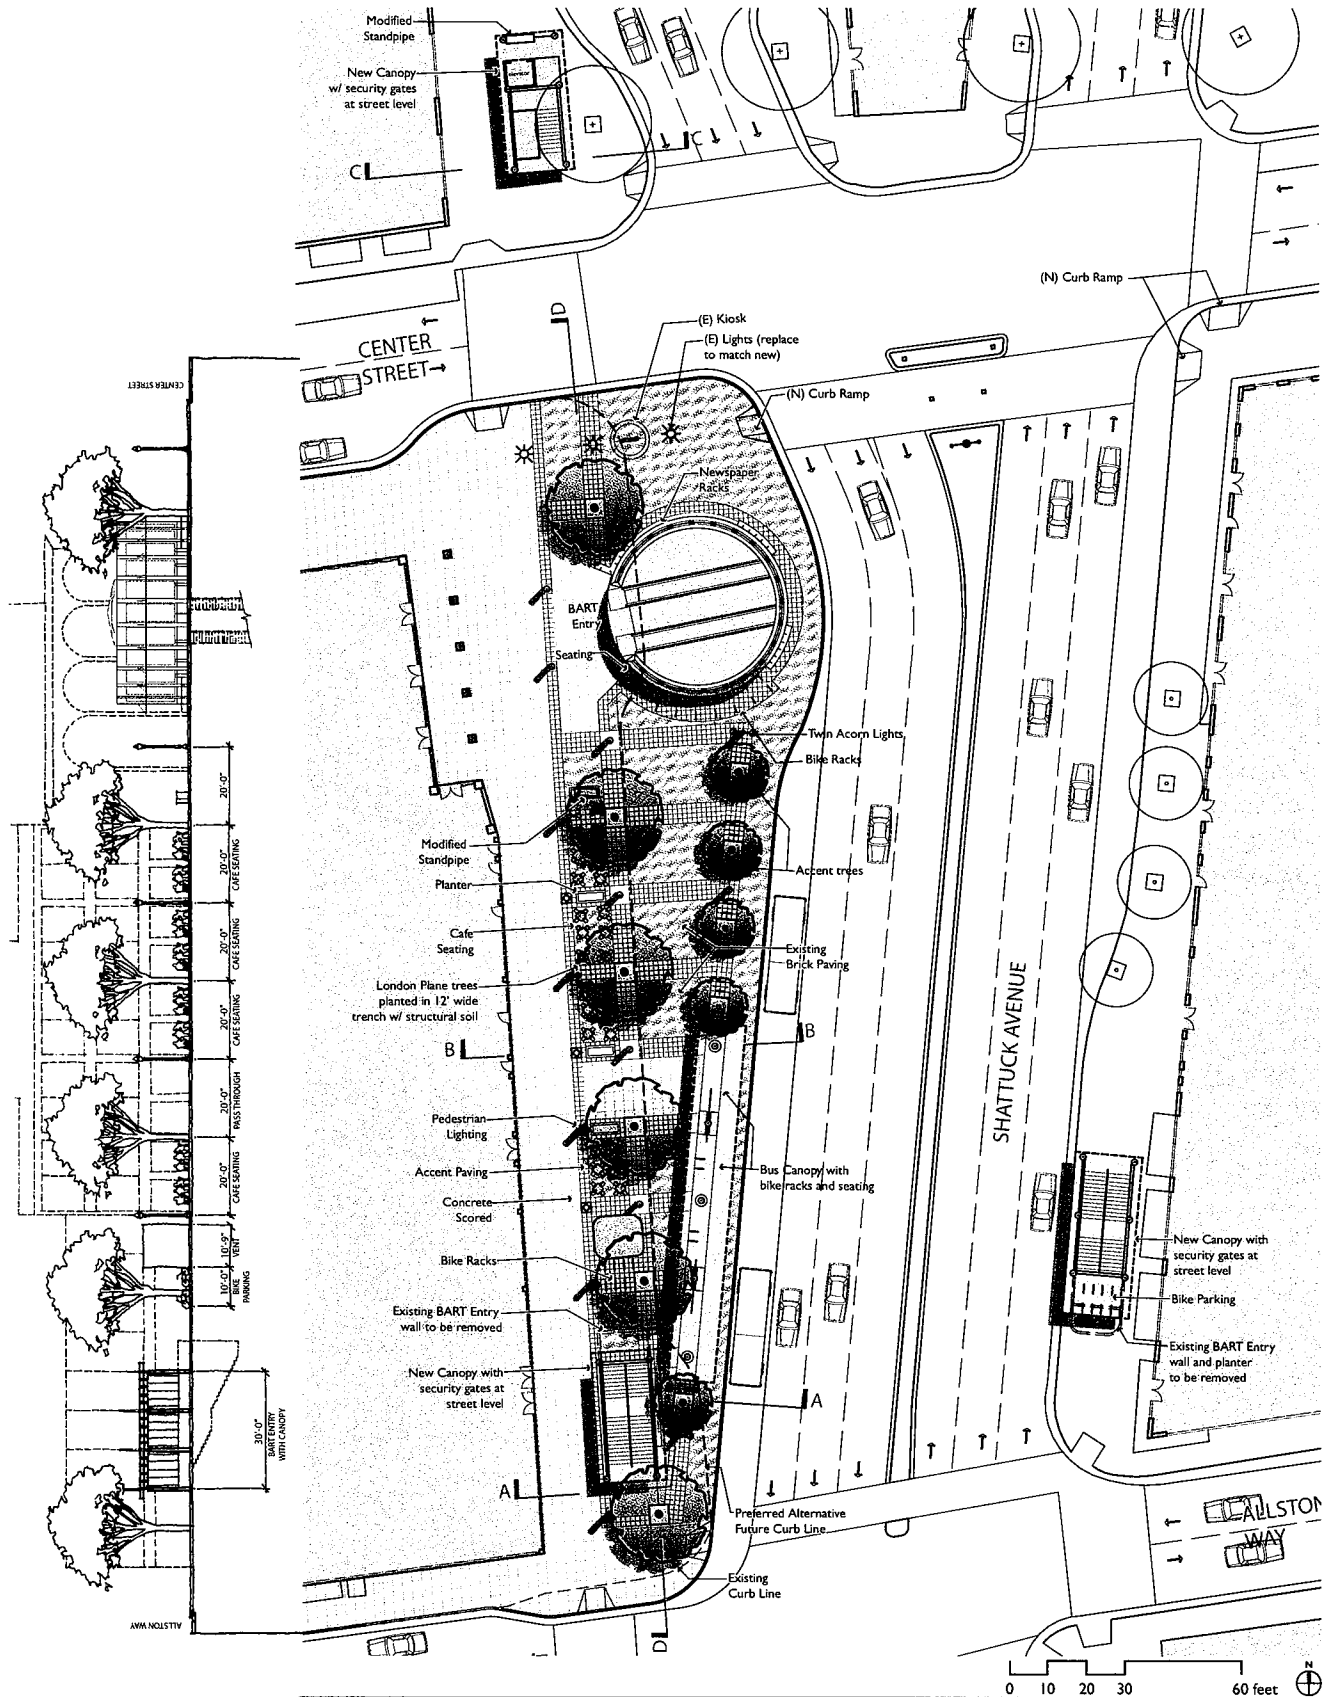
Concept Plan and Elevation (looking west) showing short-term improvements.
